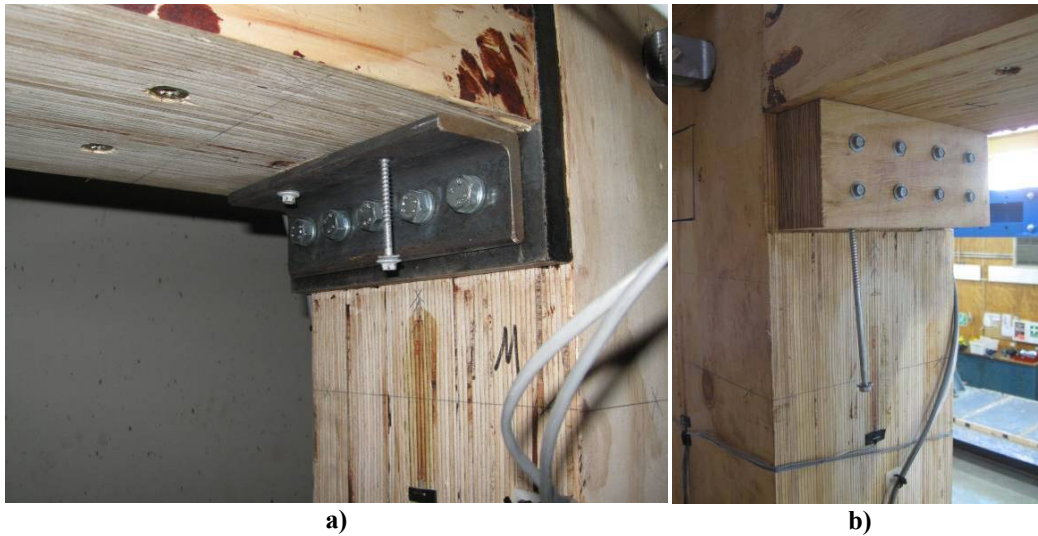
Temporary construction screws left in place during testing a) L2 b) L3
